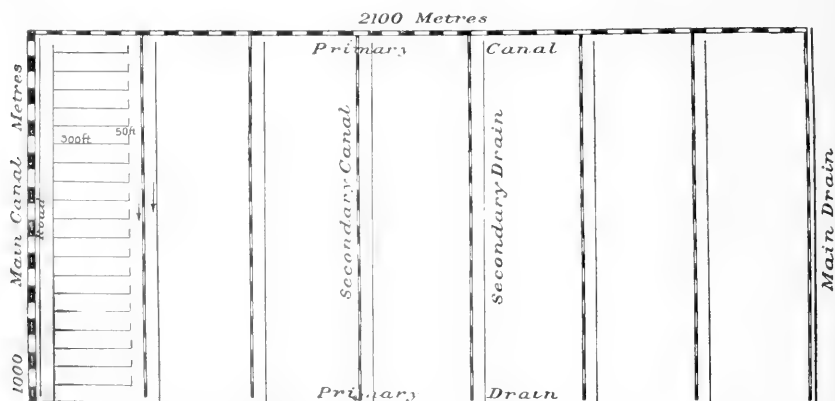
SECOND PLAN OF DRAIN ARRANGEMENT.
